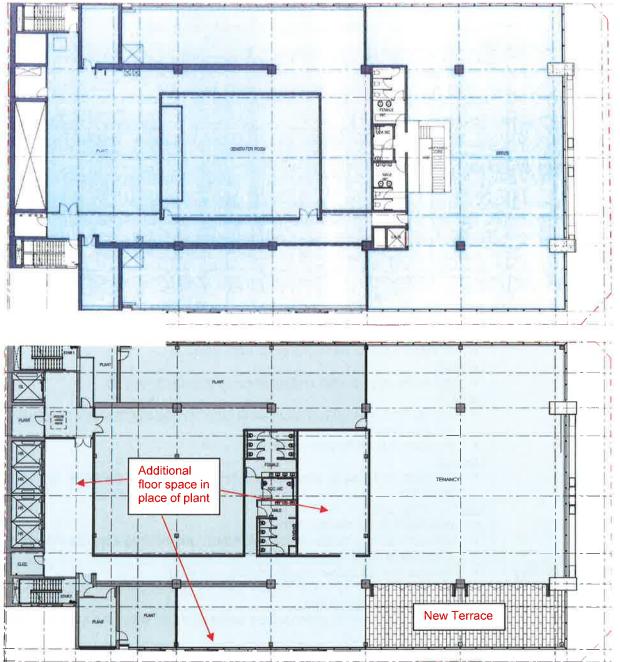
Level 35 floor plan - approved (above) and proposed (below). (Source: approved and proposed plans)
